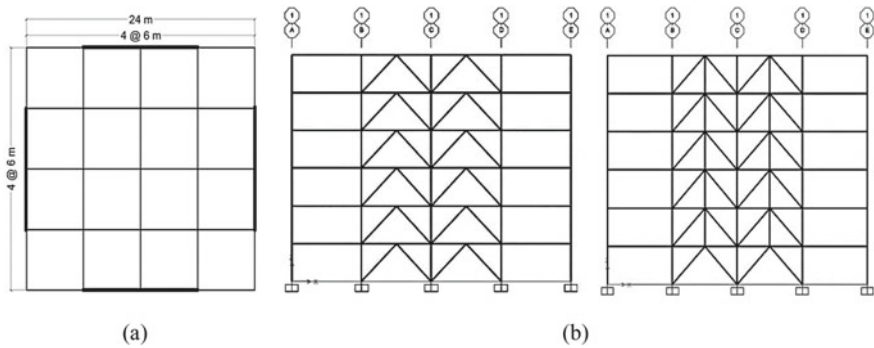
a Plan. b Elevation – dual systems with inverted V braces and strongback braced frame
